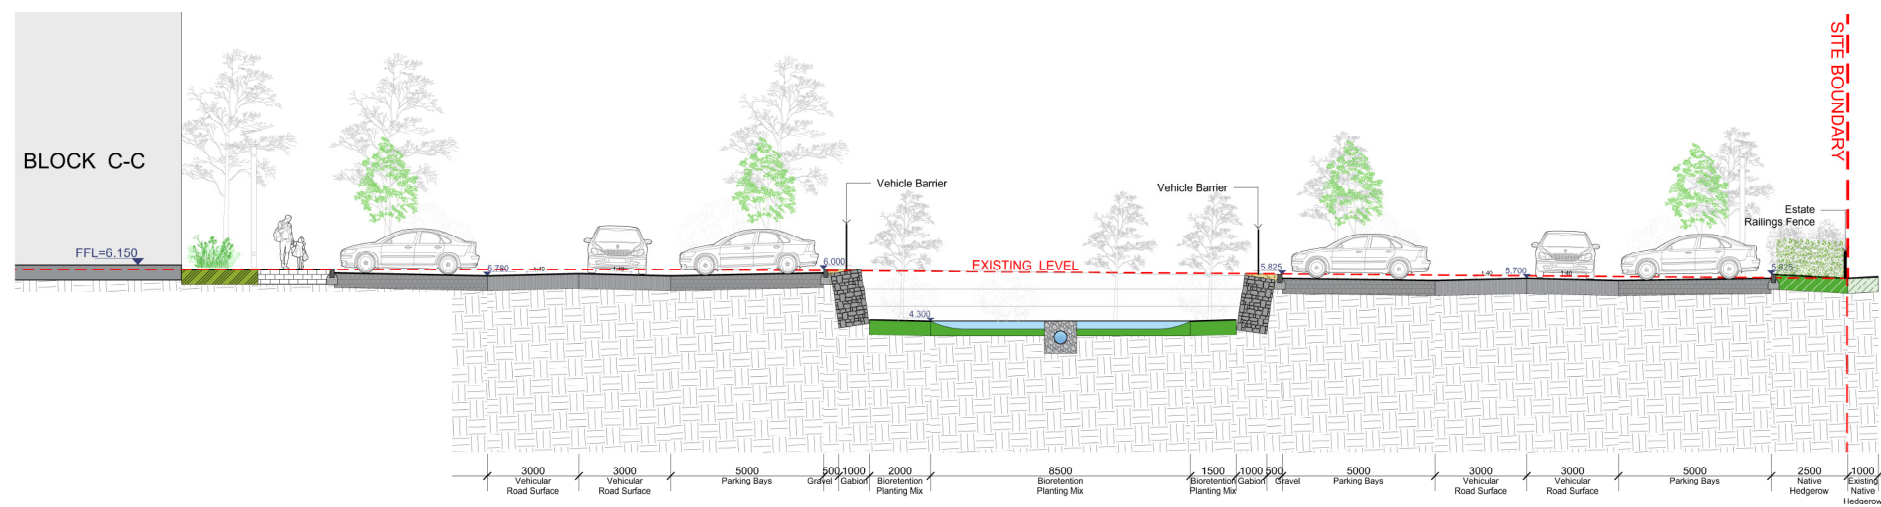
Proposed Landscaping Site Section BB, Block C and adjacent parking with bioretention area, from CSR drawing no. 25154-2-201
